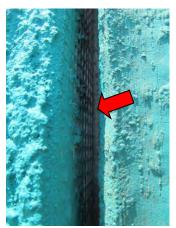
Exposed backwrapping and exterior sheathing at bottom of EIFS wall due to missing sealant and backer rod joint along south wall of Green Room.
